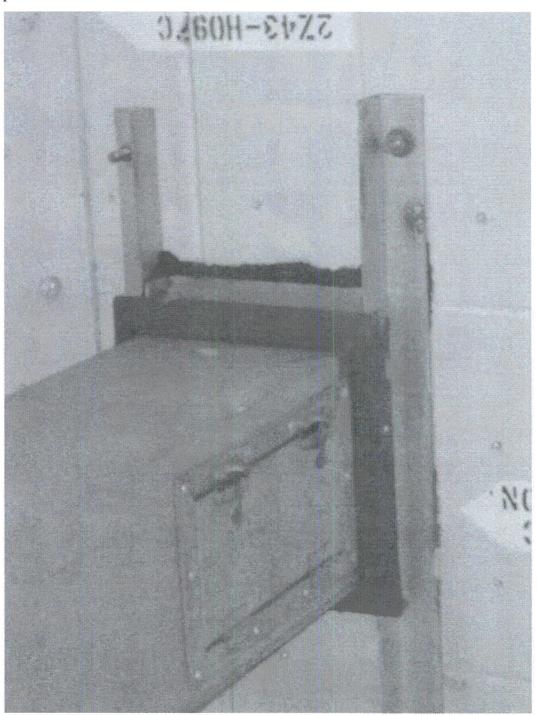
Difficult to See Nut on Anchor Bolt (Room C-027)
